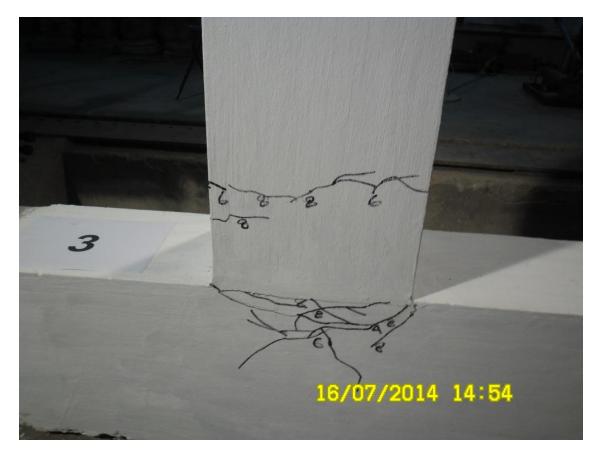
Cracking type of failure in ferrocement jacketed specimen JS2
